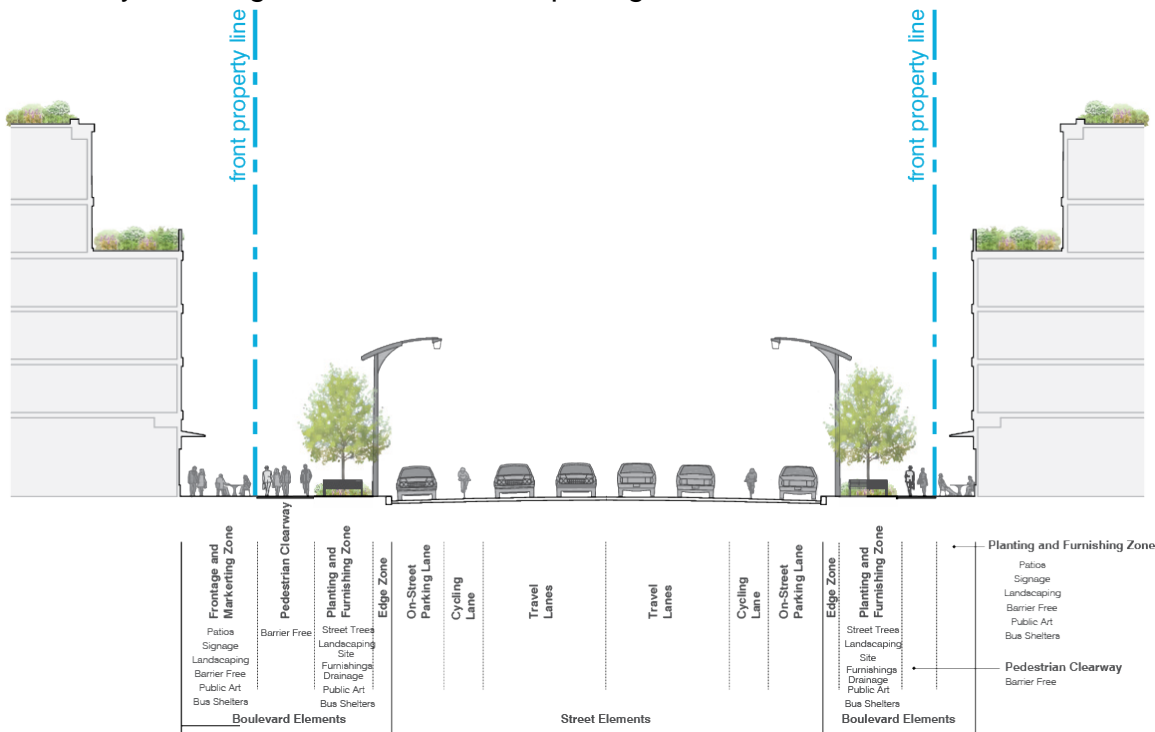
Example of typical street and boulevard elements within general right-of-way.
